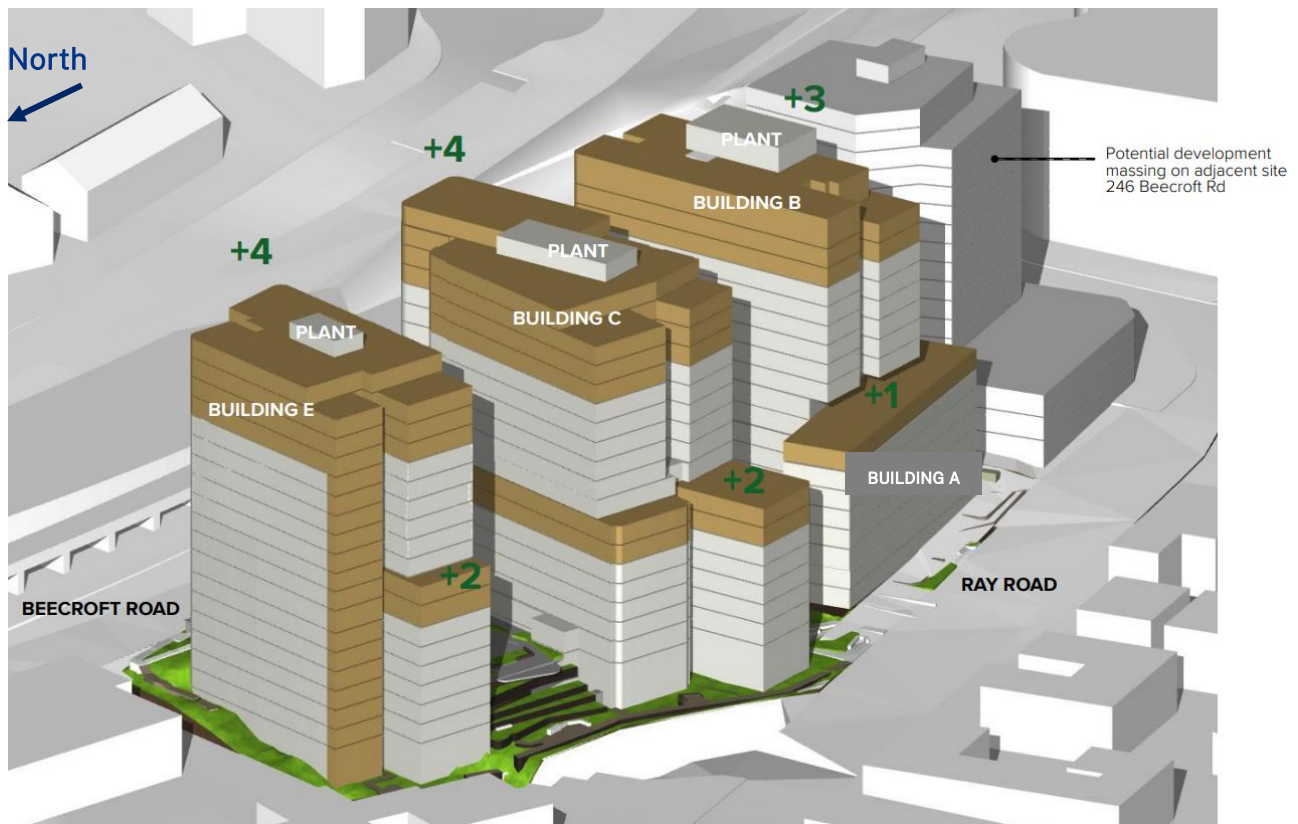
| Amending Concept building envelopes with proposed additions in storeys (Source: Applicant's EIS)
